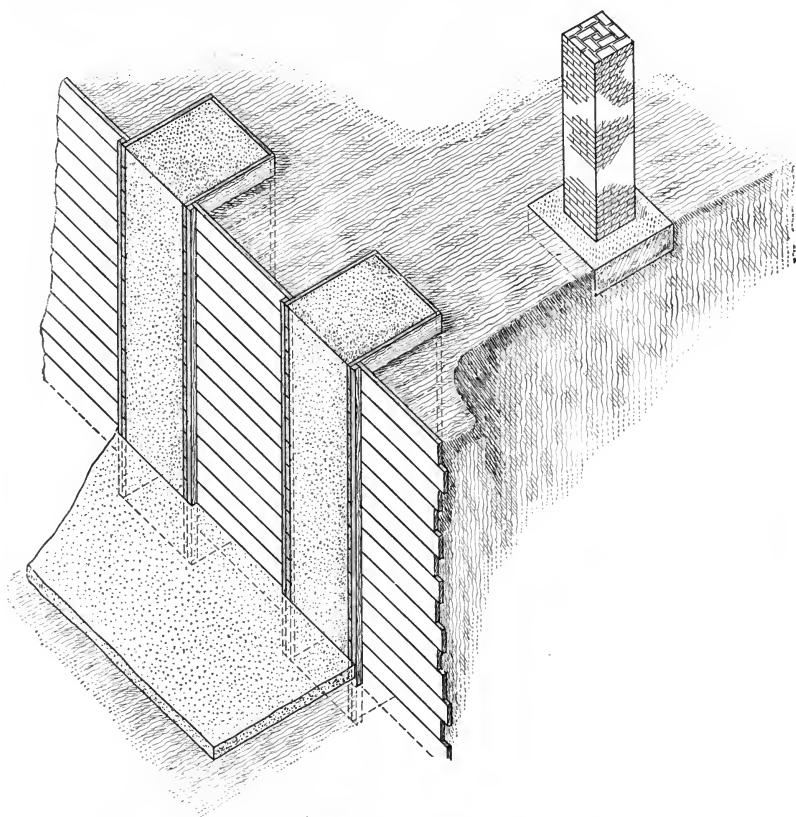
Method Known as "Protection" Used above Water-level
